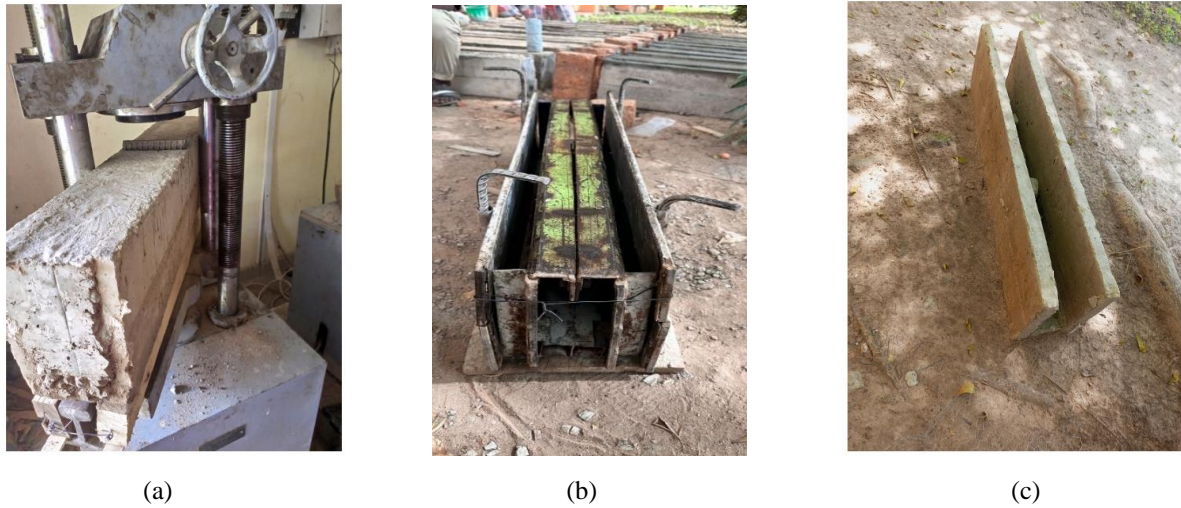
(a)-(c): Test specimens, temporary steel formwork and the permanent ferrocement form
